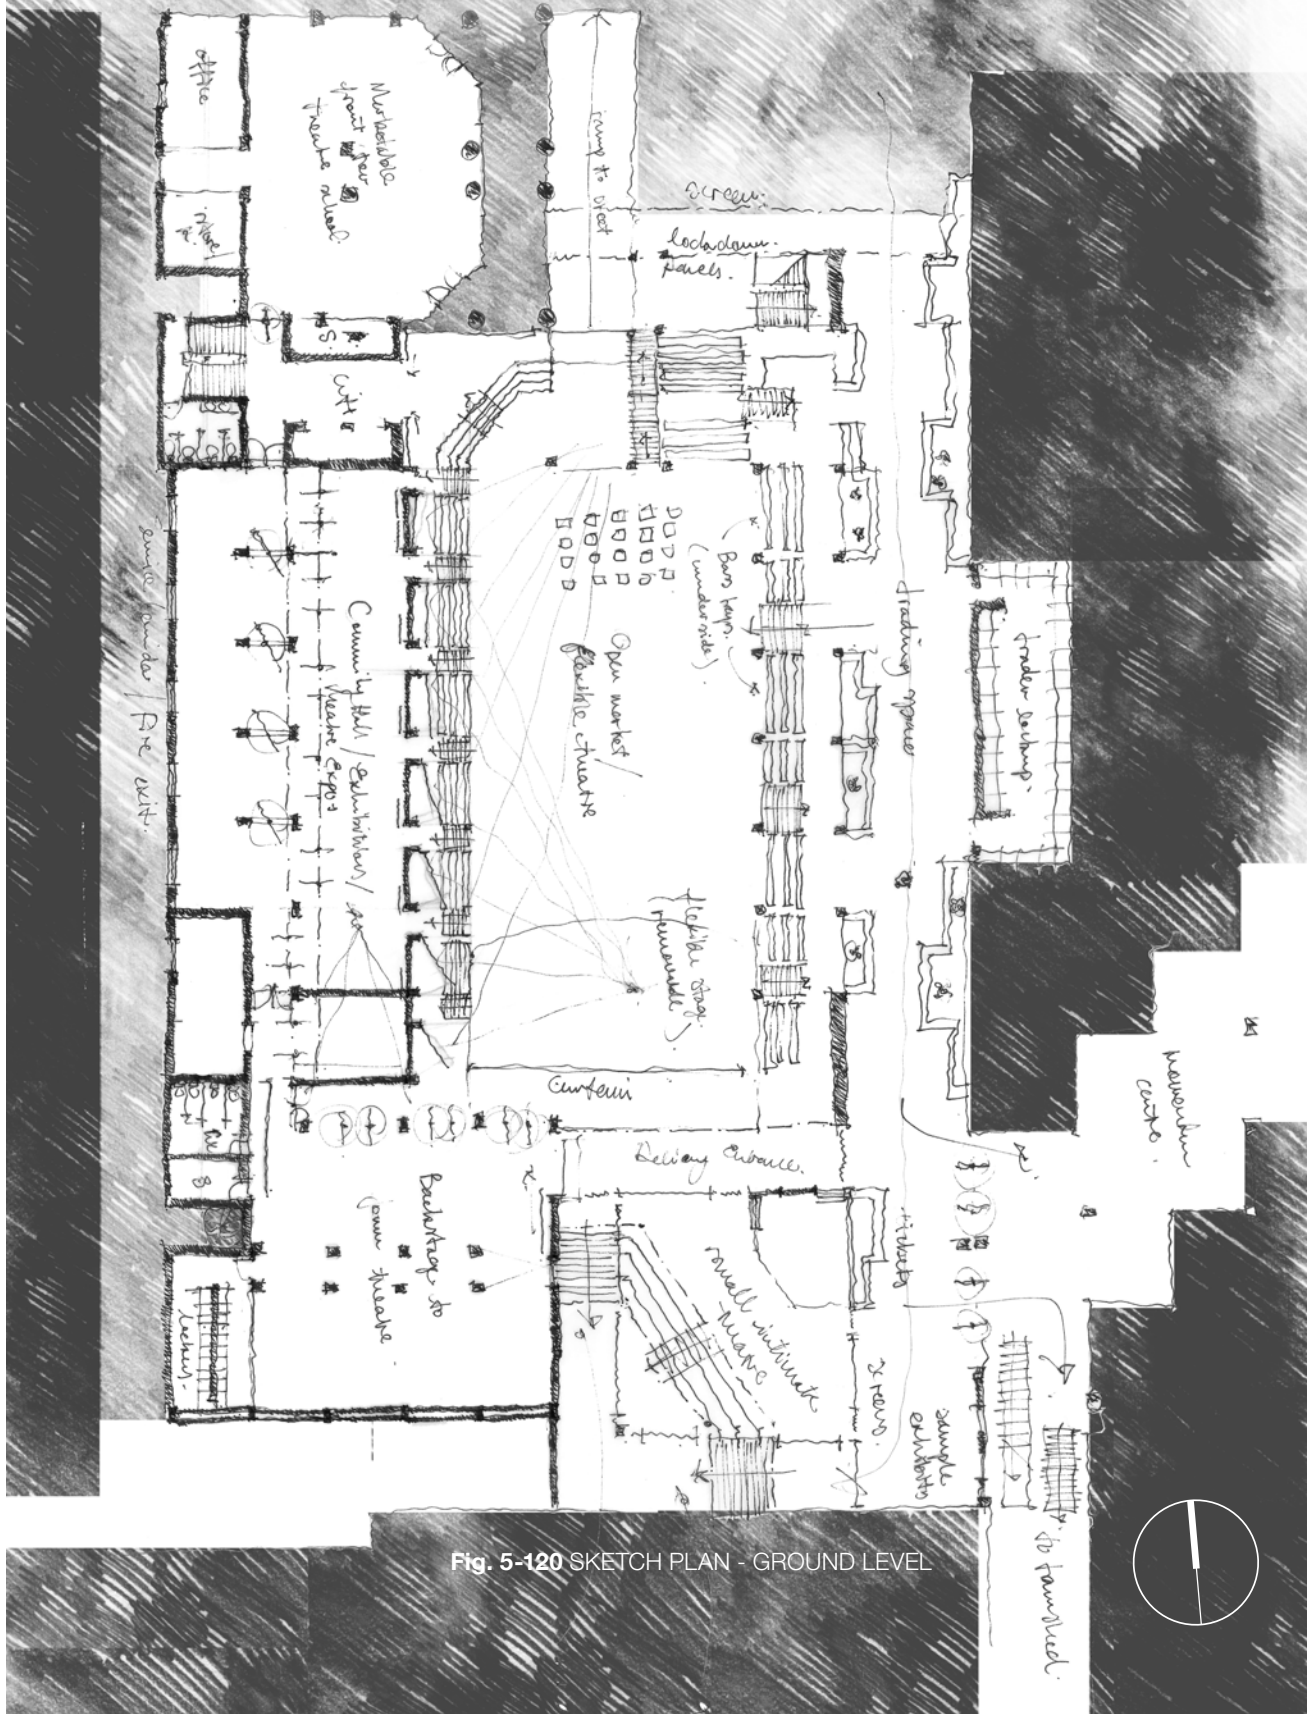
SKETCH PLAN - GROUND LEVEL
